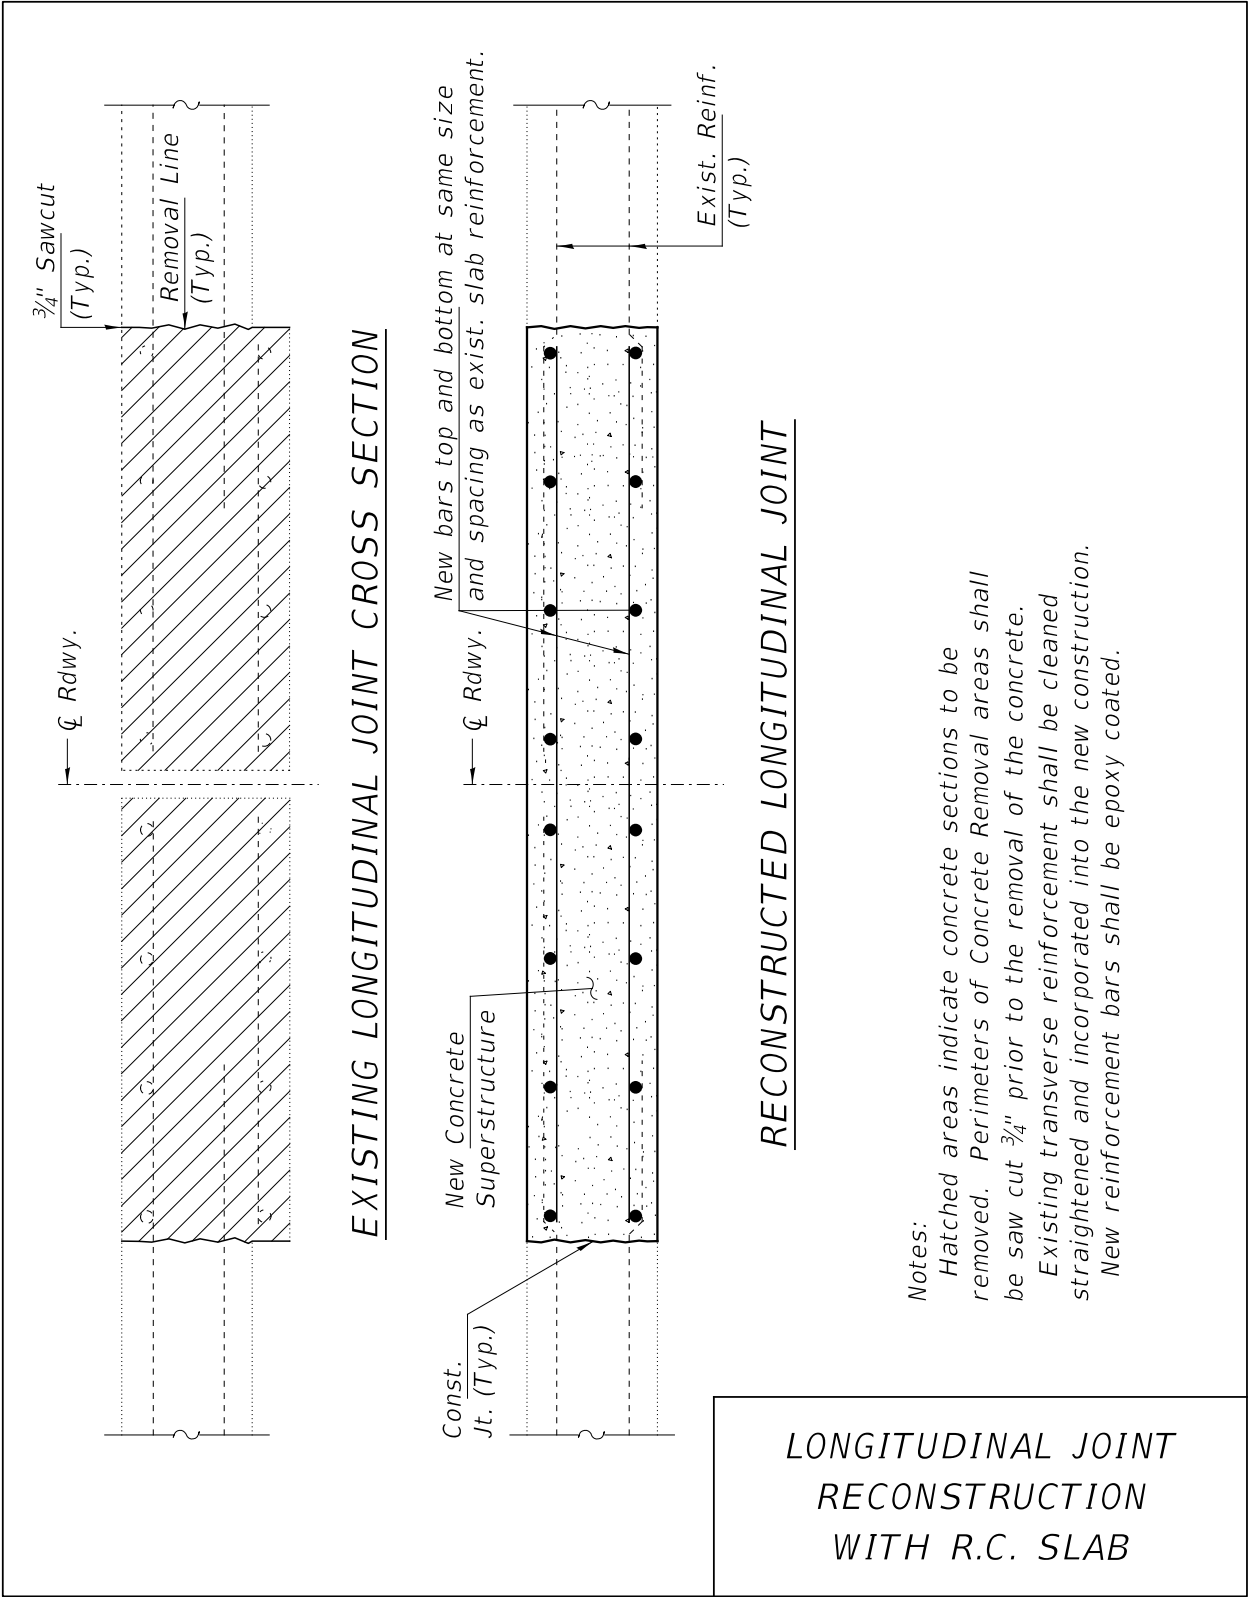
Longitudinal Joint Reconstruction with R.C. Slab
